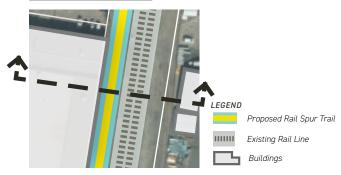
TRAIL SECTION LOOKING WEST FROM FIFTH ST
